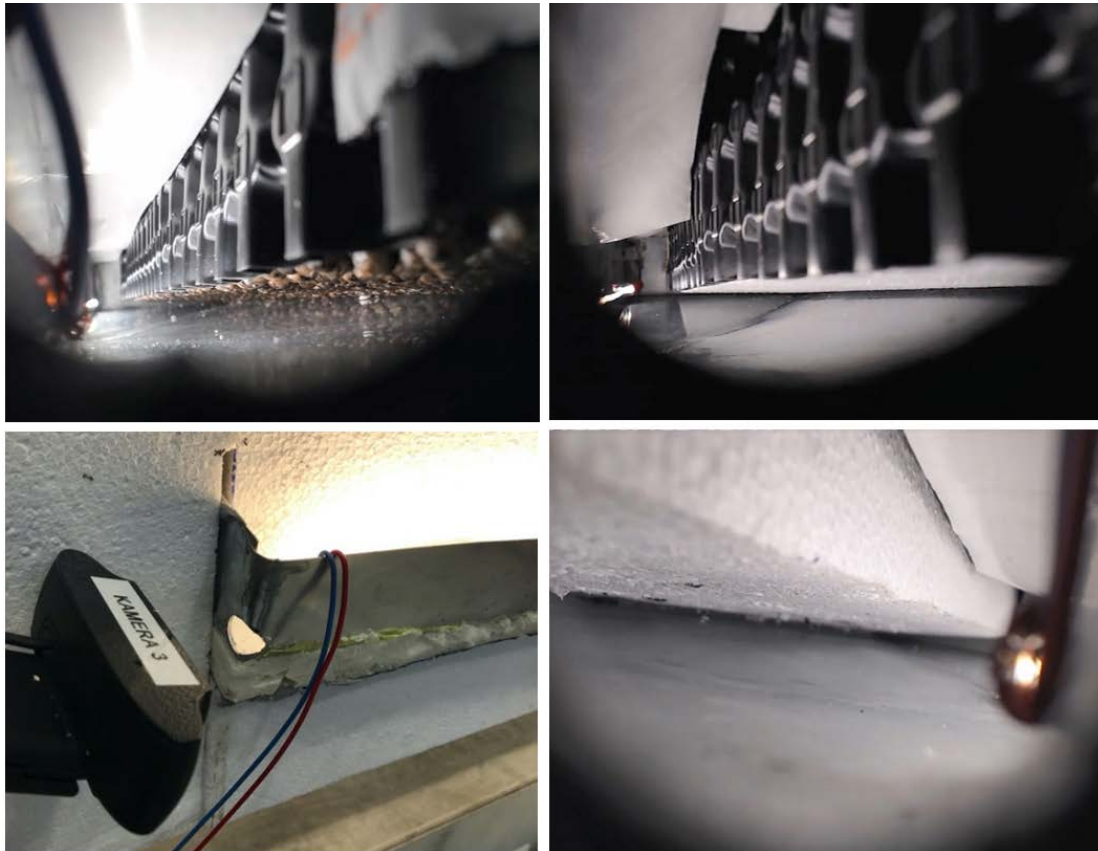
Web cameras were installed to film and take photographs of possible runoff underneath each wall segment.
